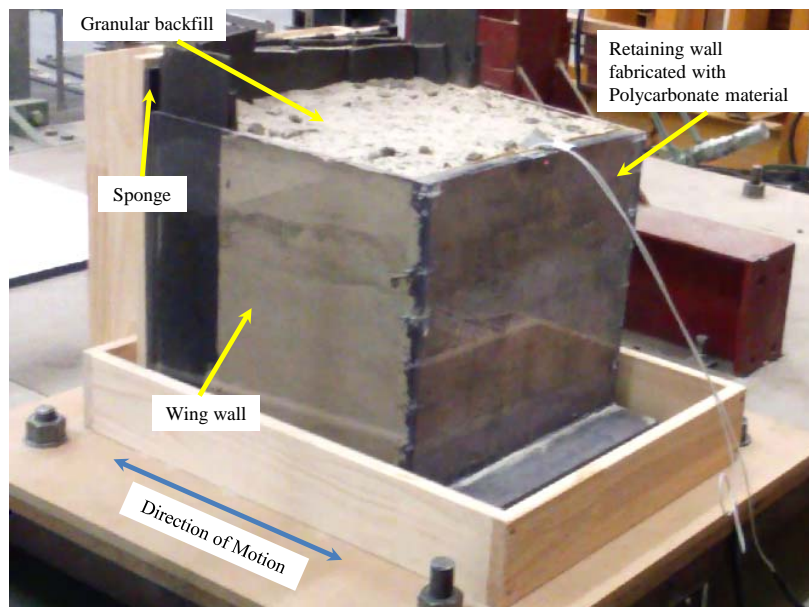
Ongoing shaking table experiment on scaled down retaining wall model.
